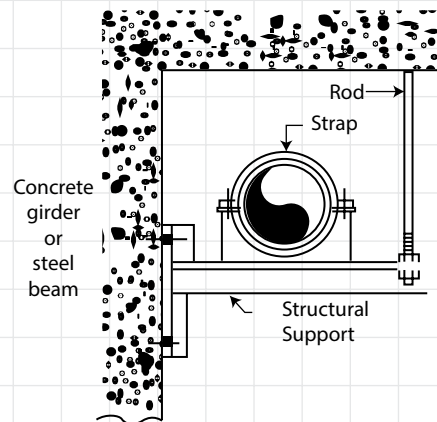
DI Pipe Support under Concrete Cantelever
